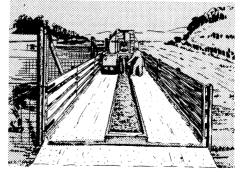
Above, Plan for garbage cooking and feeding operation. Right, Drive-through alley—C in plan. (Plan Exchange No. 5820.)
